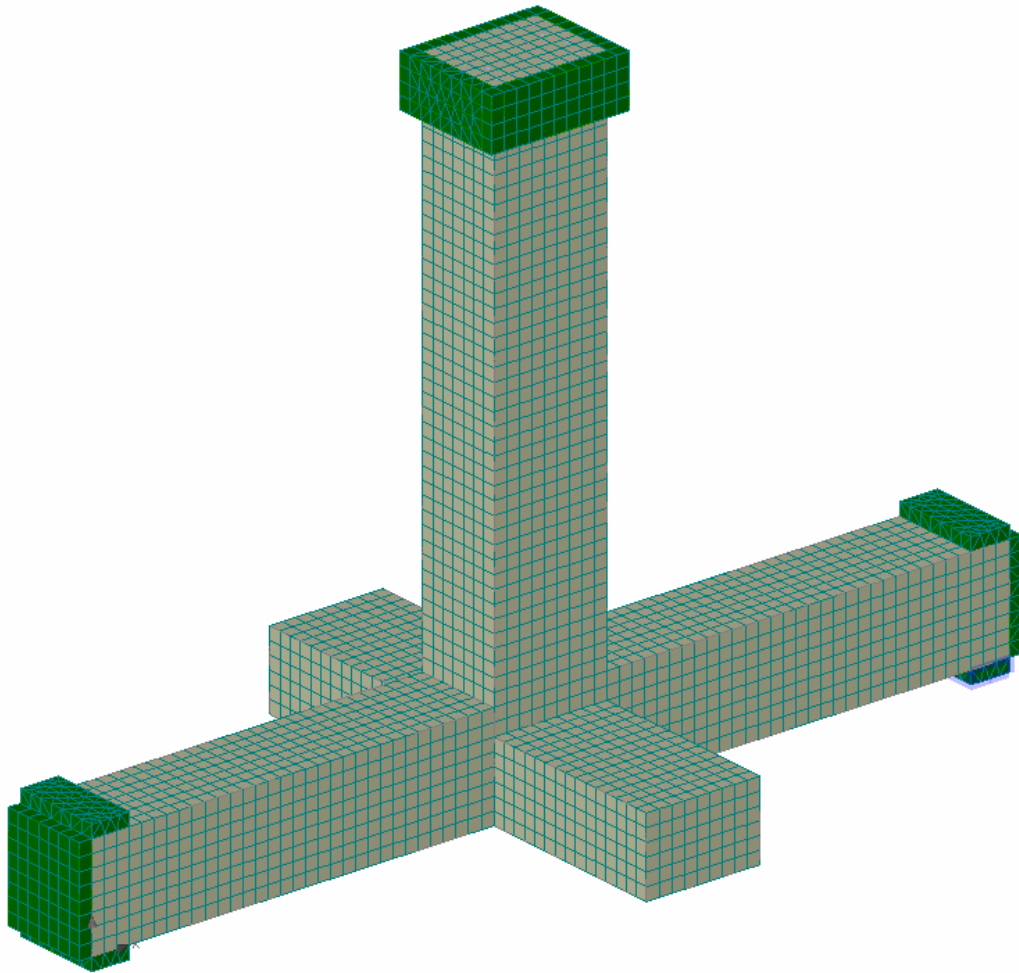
ATENA-3D finite element model for beam-column joint with lateral beams
